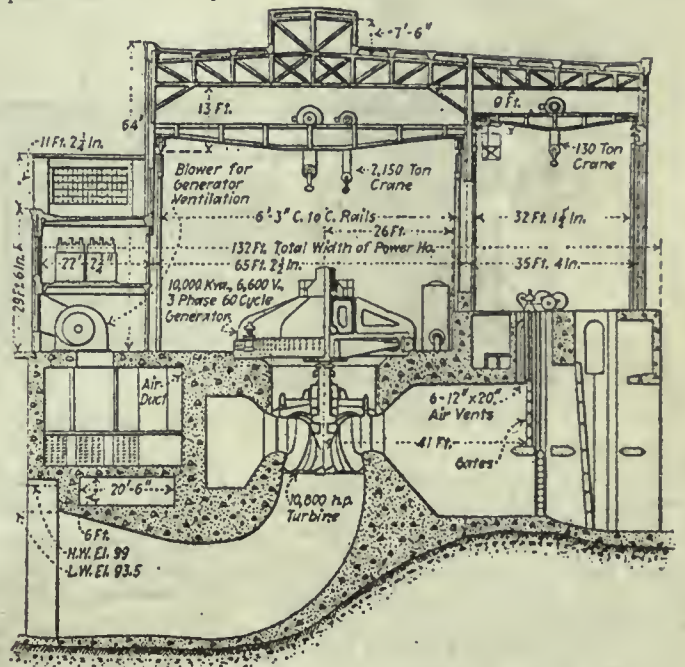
SECTIONAL ELEVATION OF HYDRO-ELECTRIC STATION.
